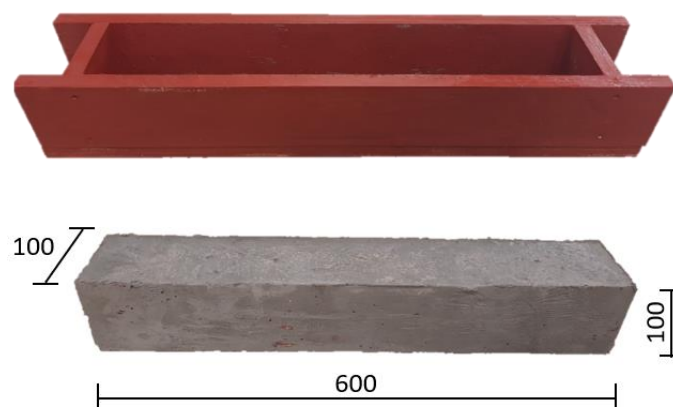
Moulds used (top) and sample produced (bottom) using the poker vibrator for compaction
